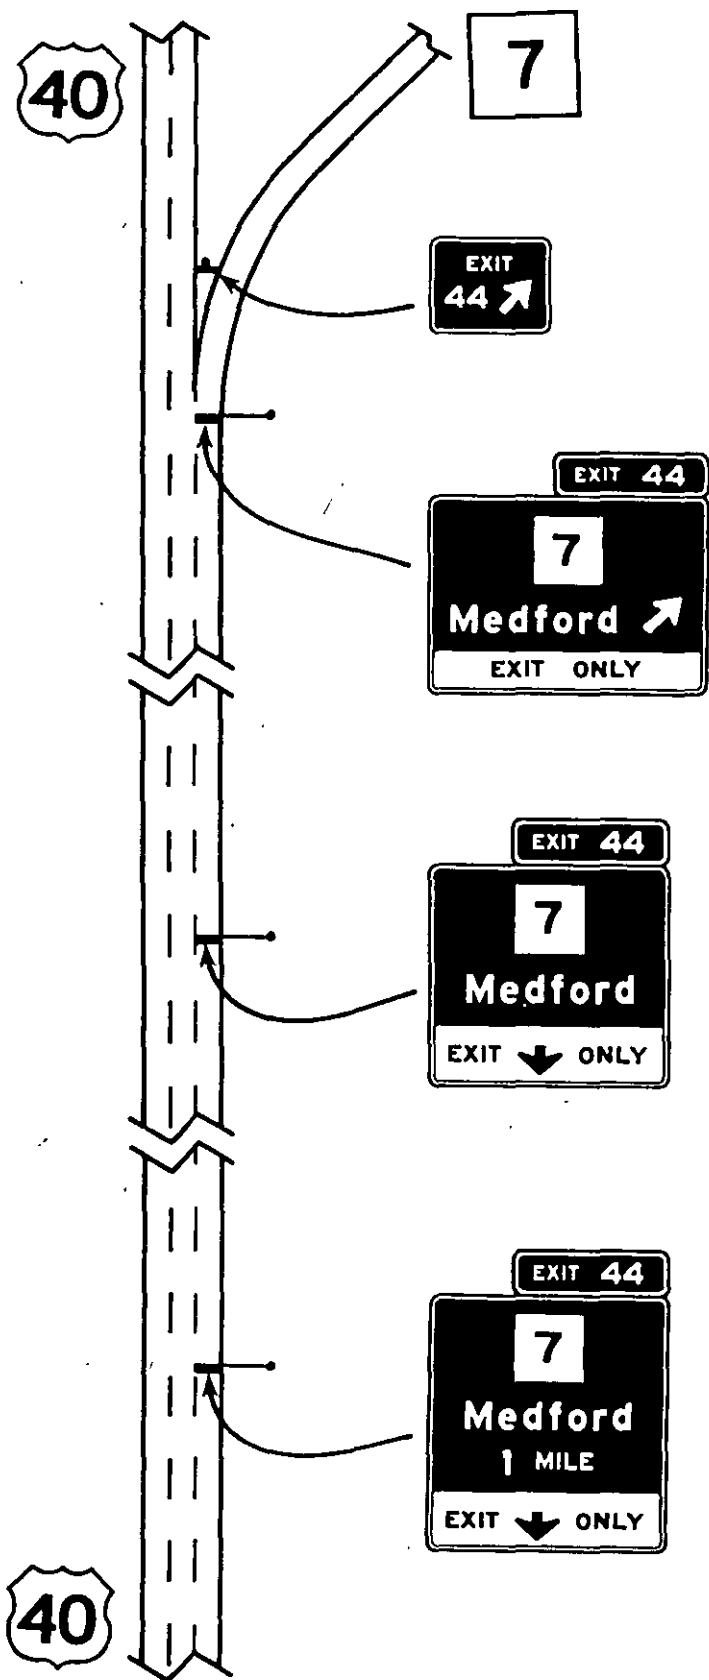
EXIT ONLY on right (Right hand interchange lane drop).
